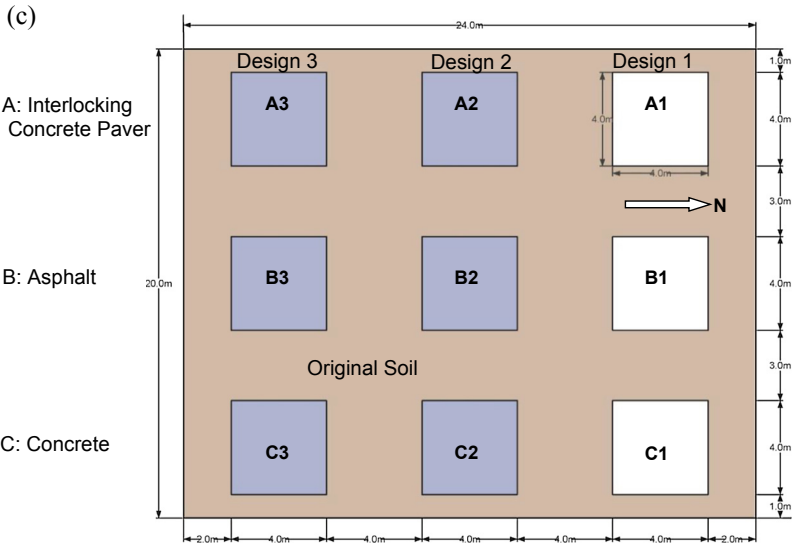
Designs of experimental sections for the cool pavement study. (a) Cross-sections for interlocking concrete paver pavements (A). (b) Cross-sections for asphalt (B) and concrete (C) pavements. (c) Schematic plan view (six permeable pavements shown in shaded area, i.e., left two columns).
